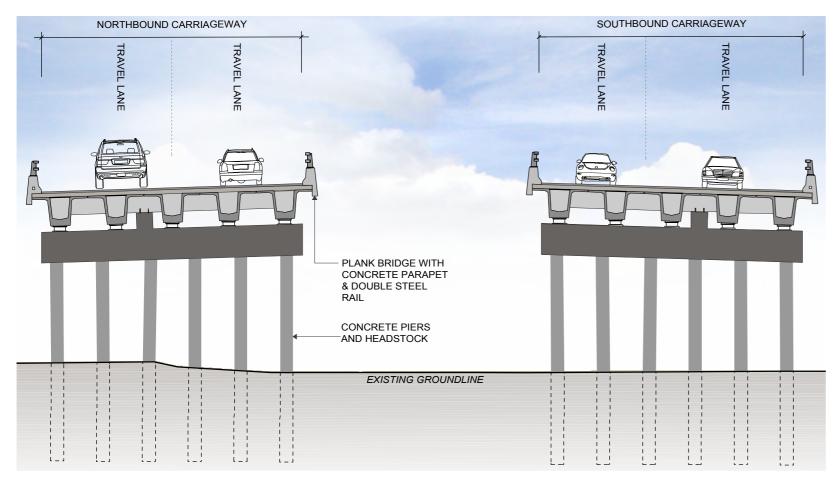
Bridge over the Pacific Highway on Kangaroo Trail Road (BR02)
